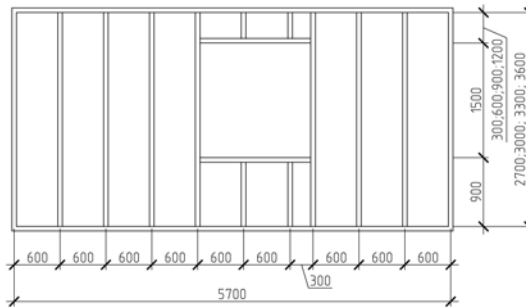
Construction of frame-filling panel with frame of rolled-formed galvanized sections for 4 dimension types
